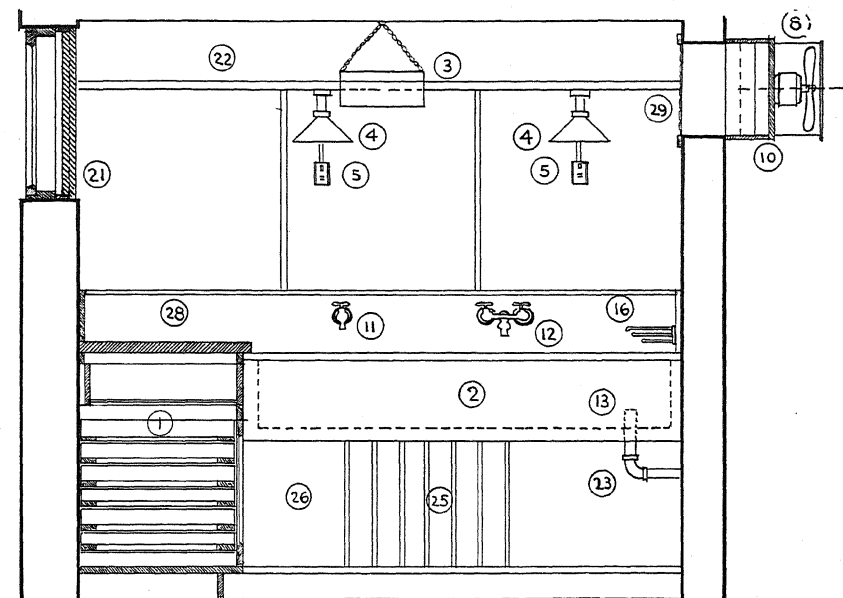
Elevation showing sink, exhaust fan, safe lights, drying racks, etc.
